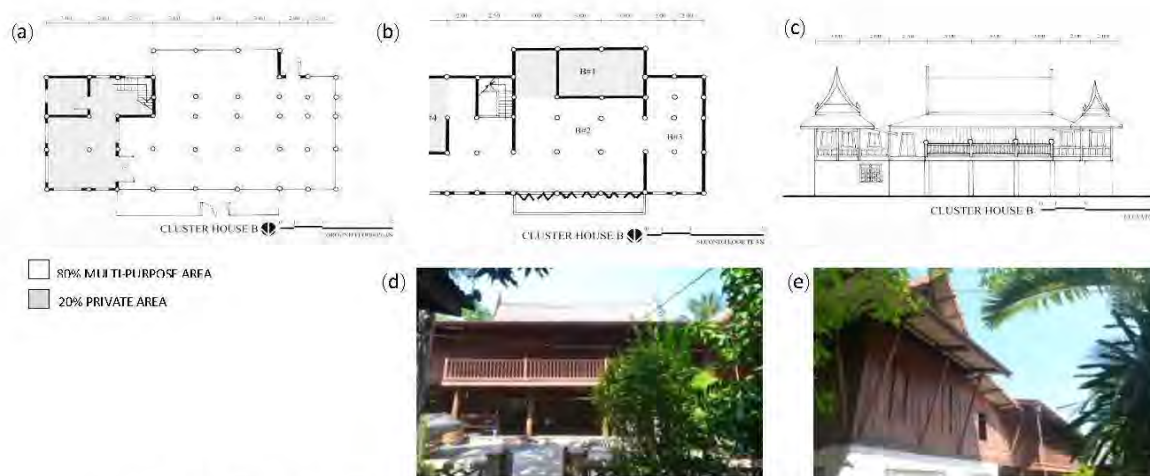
House Cluster B (a) First Floor plan (b) Second Floor Plan (c) Elevation (d) House B#2(e)House B#4
